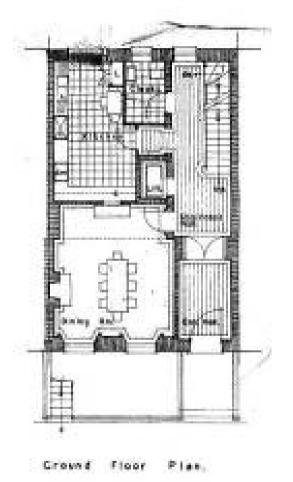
Extract of Ministry of Works plans, 1946 Ground Floor for Chester Terrace Nos. 25 – 23. Crown Estate Archive.
